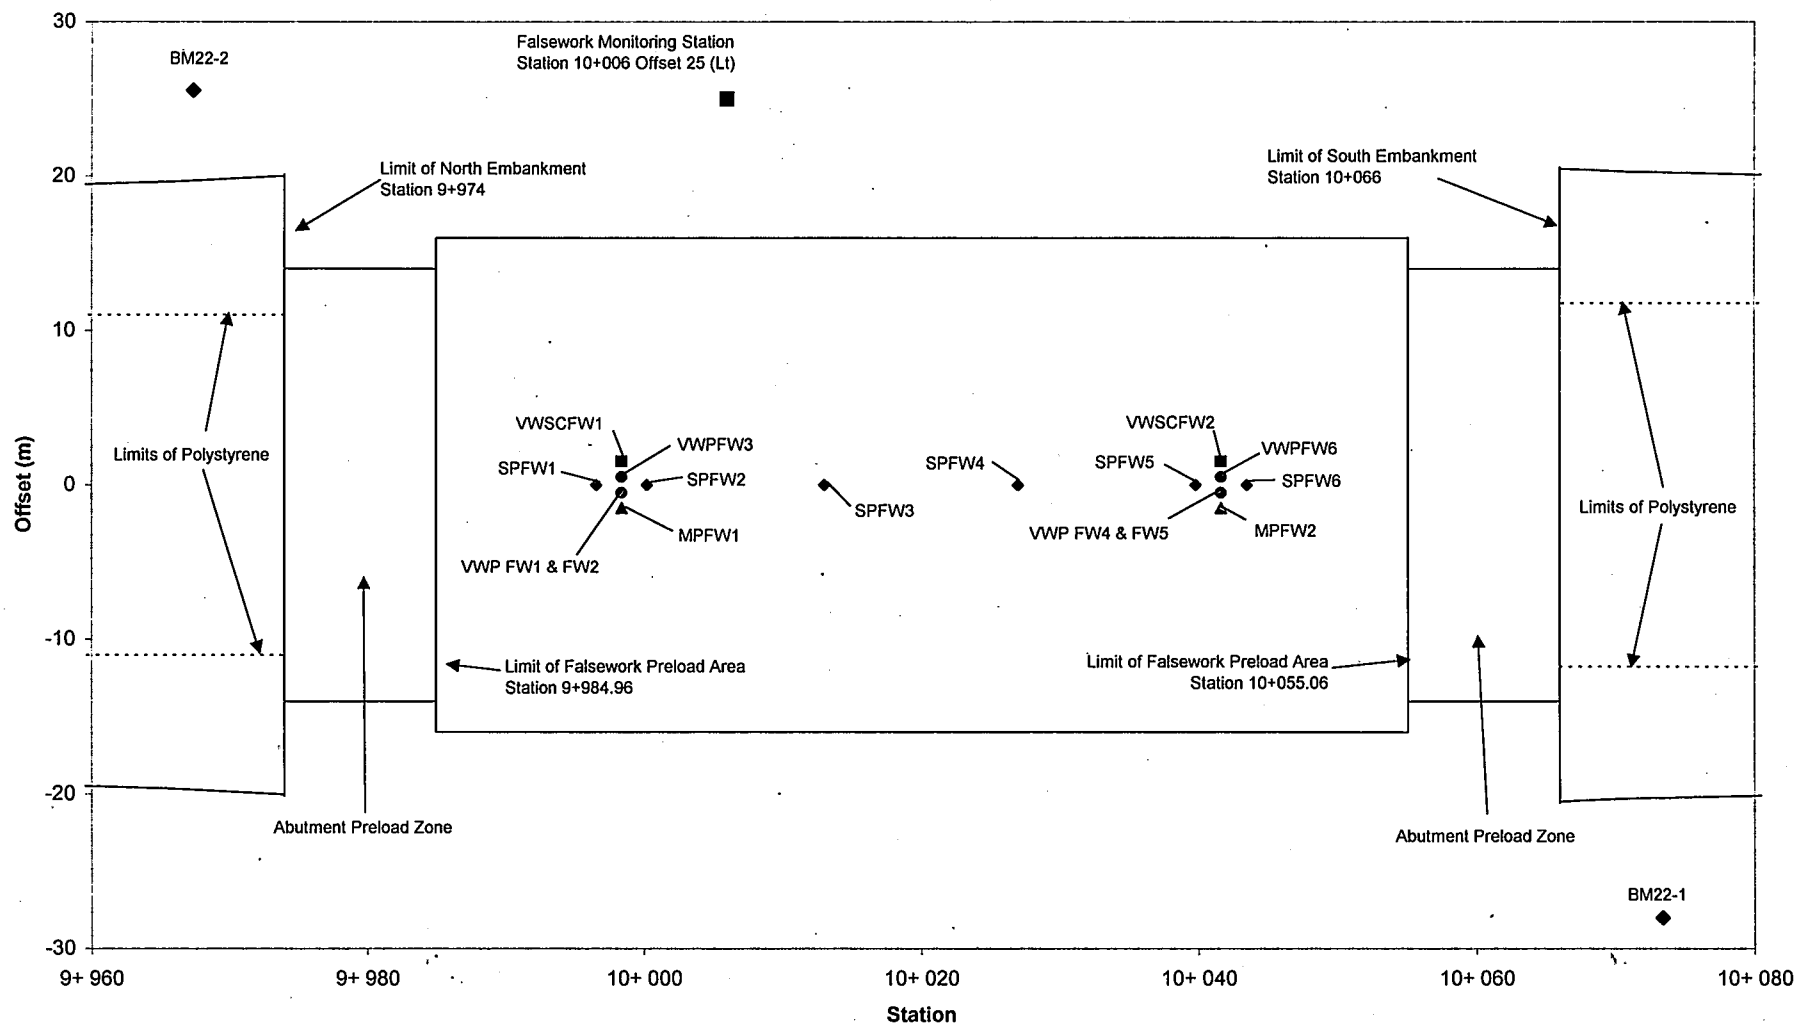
Instrumentation Layout, Falsework Foundation, Regional Road 22
